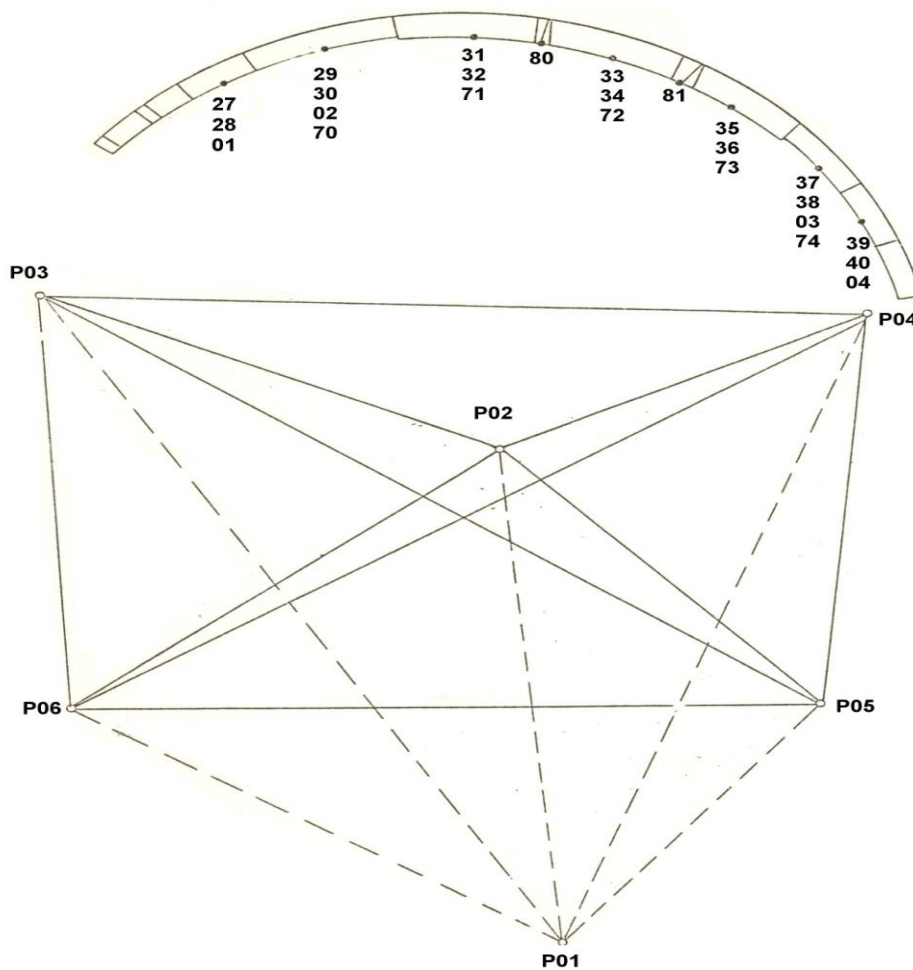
Plan view of the geodetic survey network at Poortjieskloof Dam
